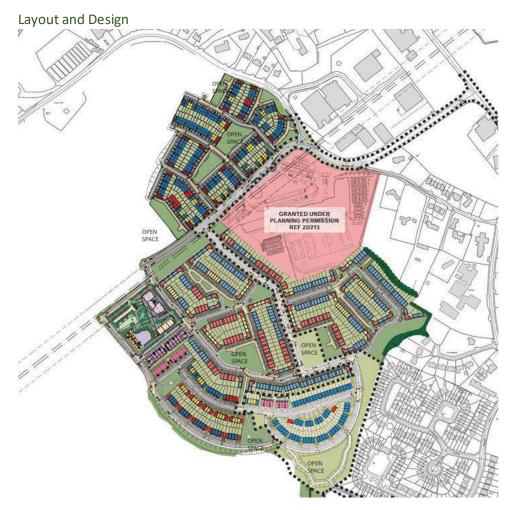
Final Site Layout Plan (Source: BKD Architects, 2025)
